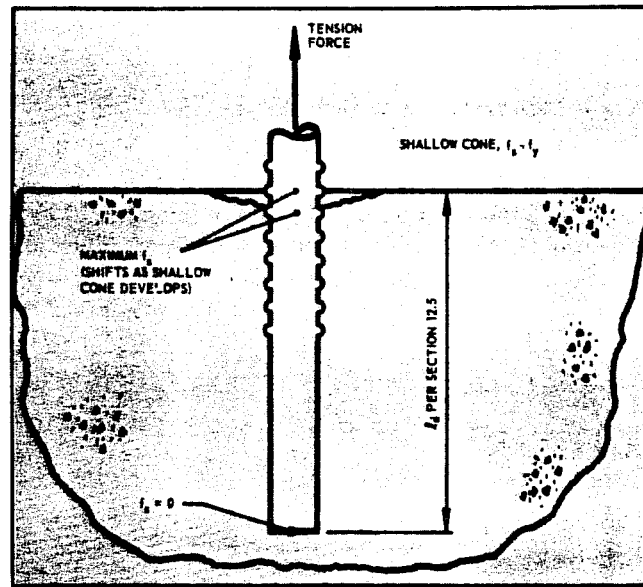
Bar Stress for Embedded Rebar in Concrete
